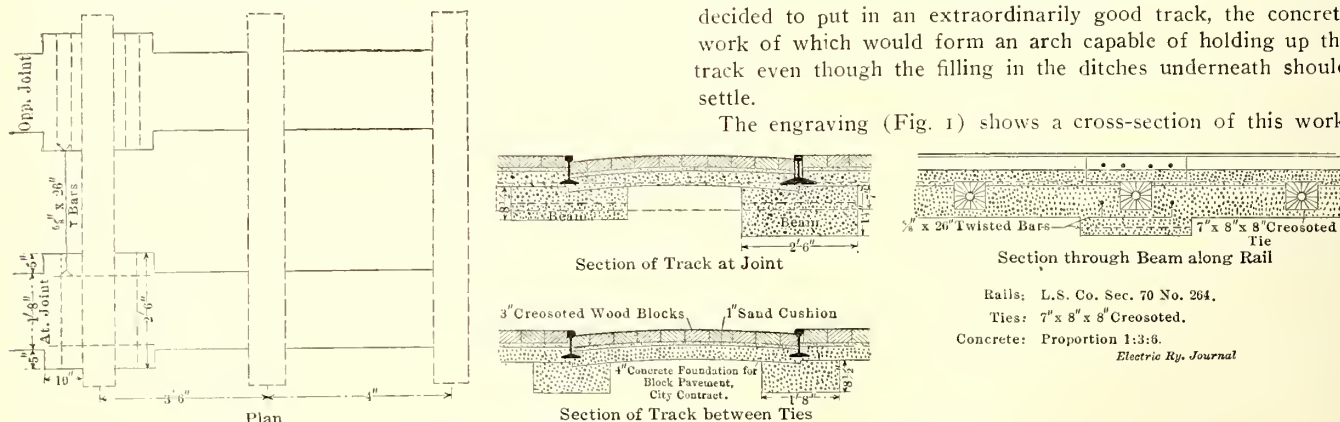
Standard Concrete Beam Construction in Mobile, Ala.
